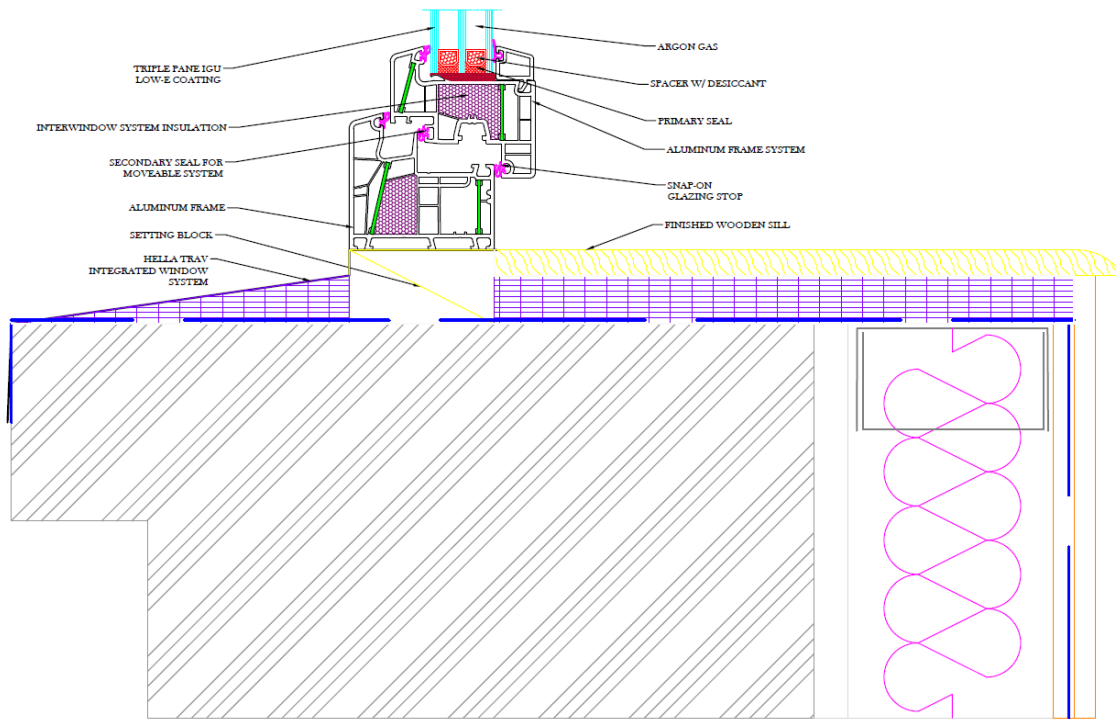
Building 12 Schematic Drawing 3-Lower Window Section
